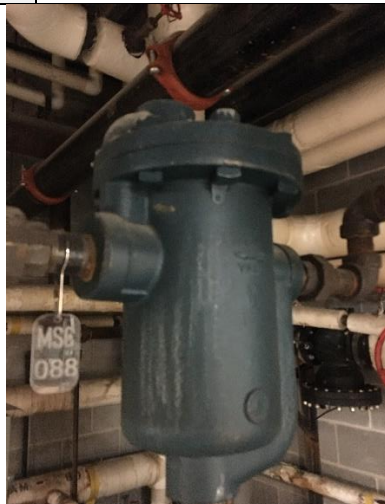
Building 1 – Mechanical Room 830 <0.5% lead
